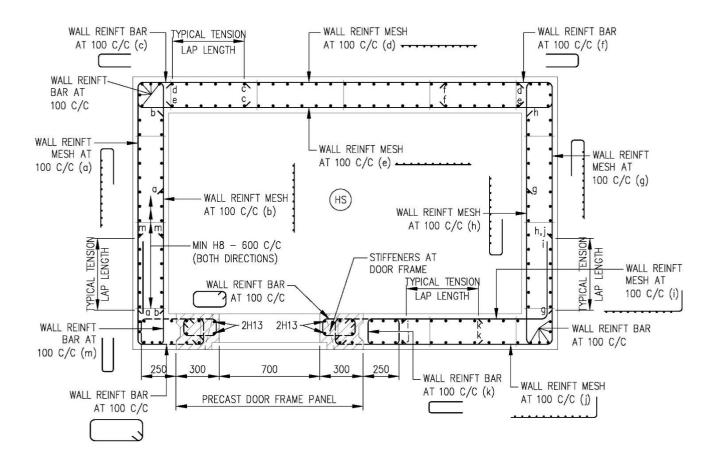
(j) DETAILS OF SHEAR LINKS IN HS SLABS/WALLS
